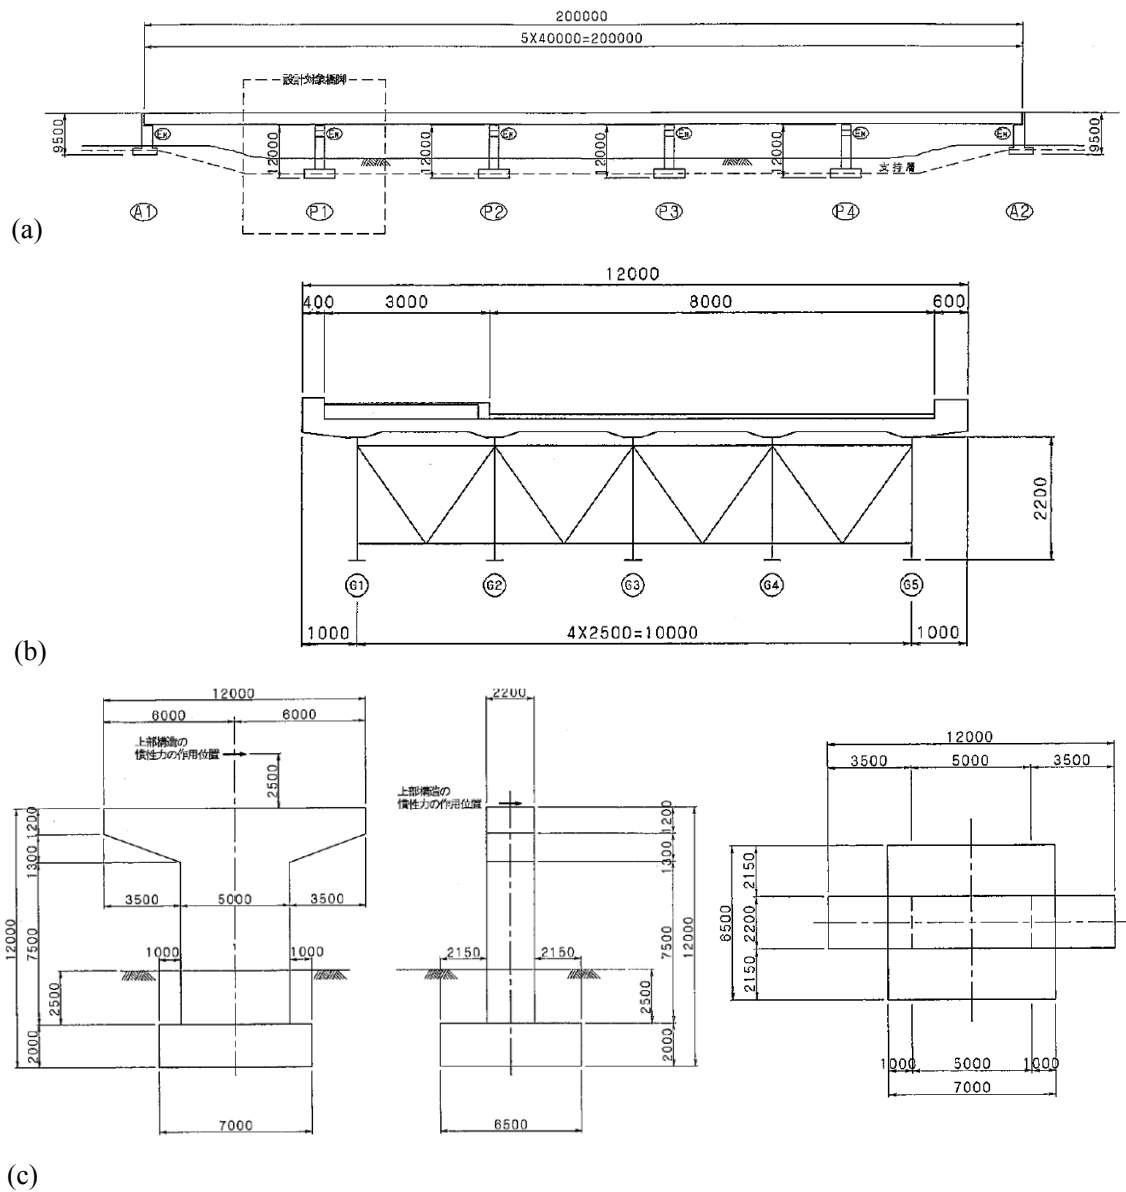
Configuration of the isolated bridge pier (unit: mm): (a) side view of the longitudinal direction bridge, (b) cross-section of the superstructure, (c) front view, side view, and plan view of the pier in the order from left to right.
